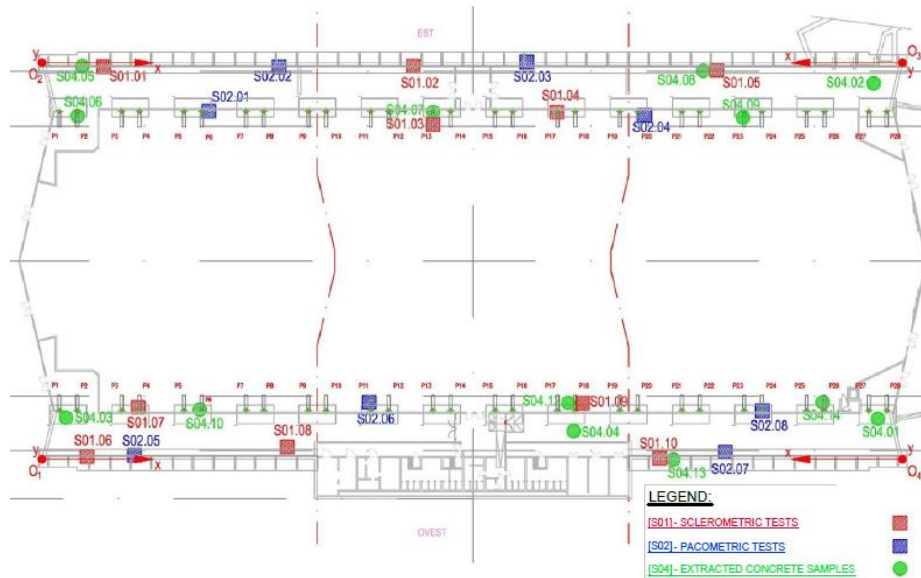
Pavillion V: Test positions at the underground floor (MASTRLAB DISEG, 2019)
